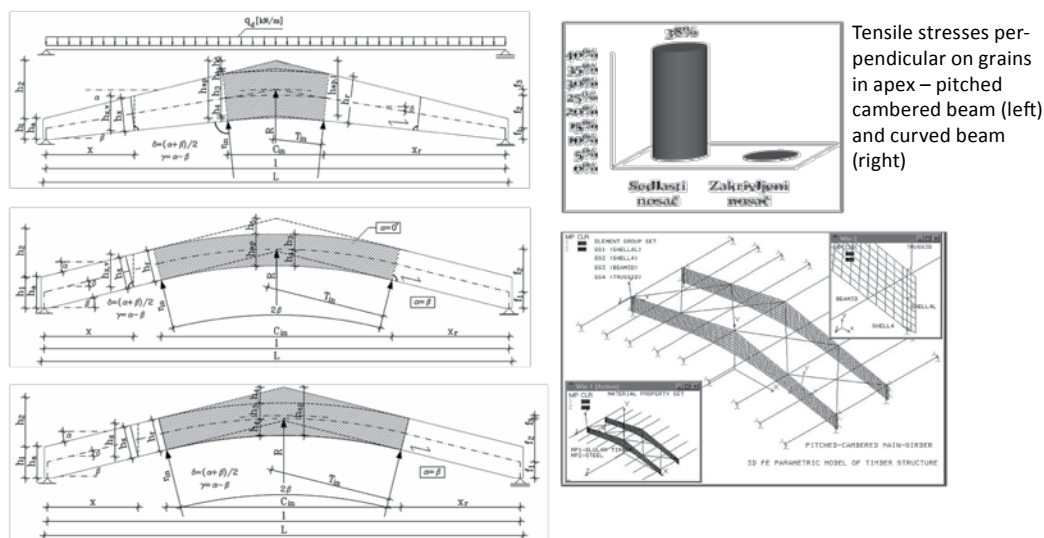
Pitched cambered beams and curved beams (cambered beams with non-glued apex - reduced static depth of cross-section) on left. 3D parametrically prepared FE models – SHELL4L (girder), BEAM 3D (purlin), TRUSS 3D (bracing diagonals) and PLATE FE (just for upper support plates) on right.
